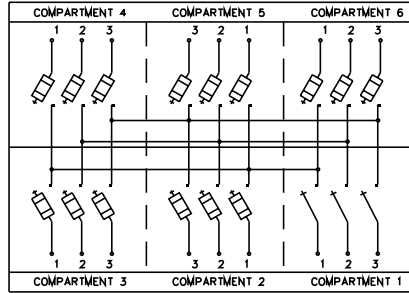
Three incoming switches and three fused feeders
